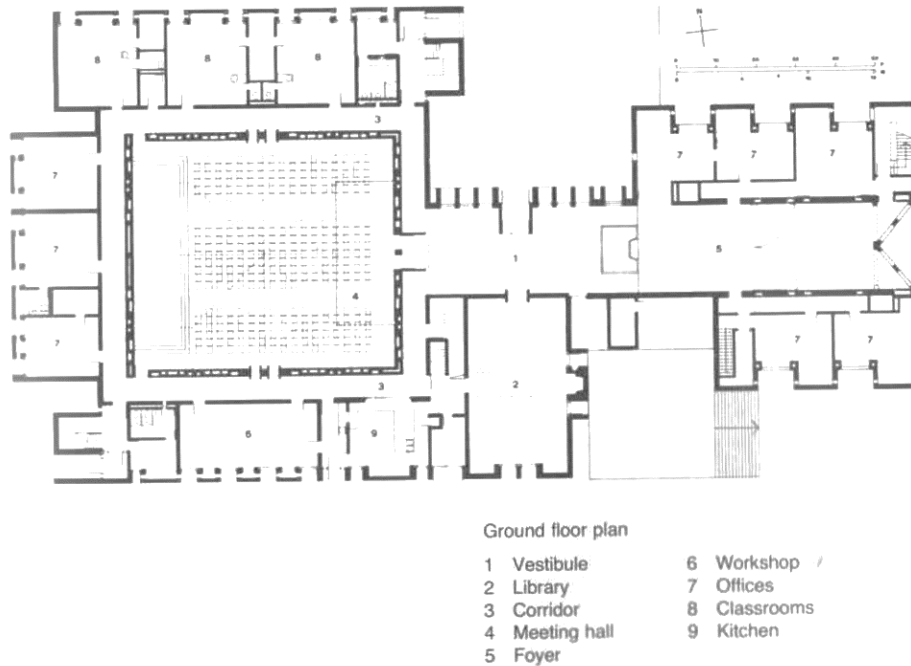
Louis I. Kahn. Ground floor plan, with original building to the west and later expansion to the east. First Unitarian of Rochester, Rochester, Ny, 1959-67.
